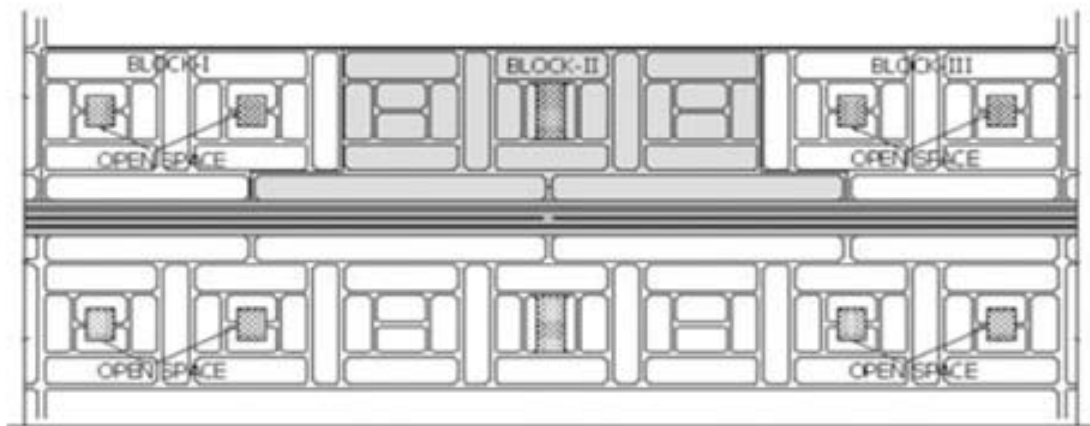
Conceptual layout of neighbourhood and block in the proposed Outer Ring Road project [Source: Welink, 2005]
